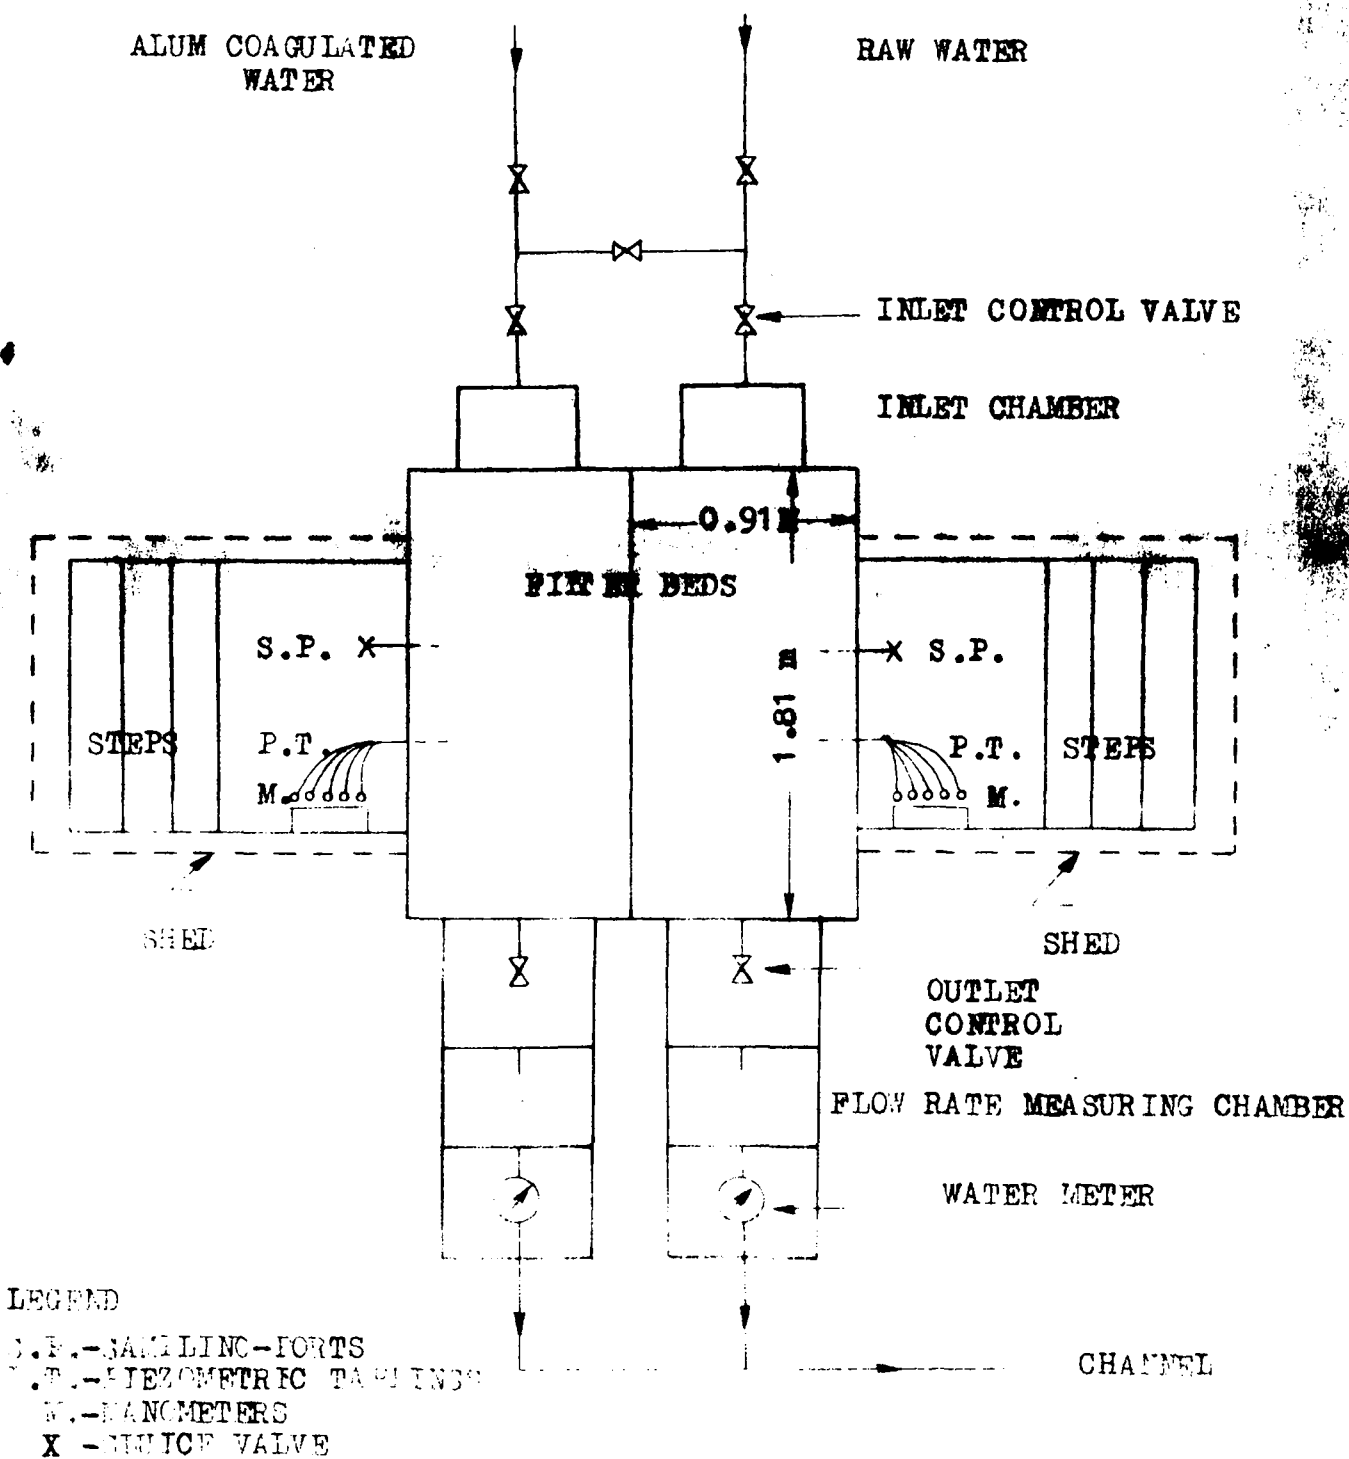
LAYOUT PLAN OF PILOT SCALE FILTERS
